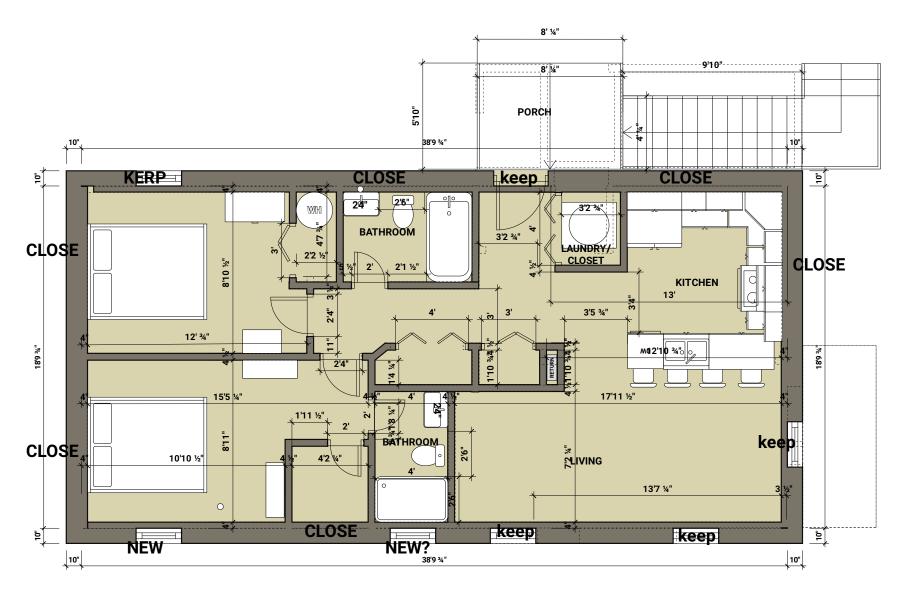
855 EAST BANK STREET RENOVATION BUDGET: 142K
